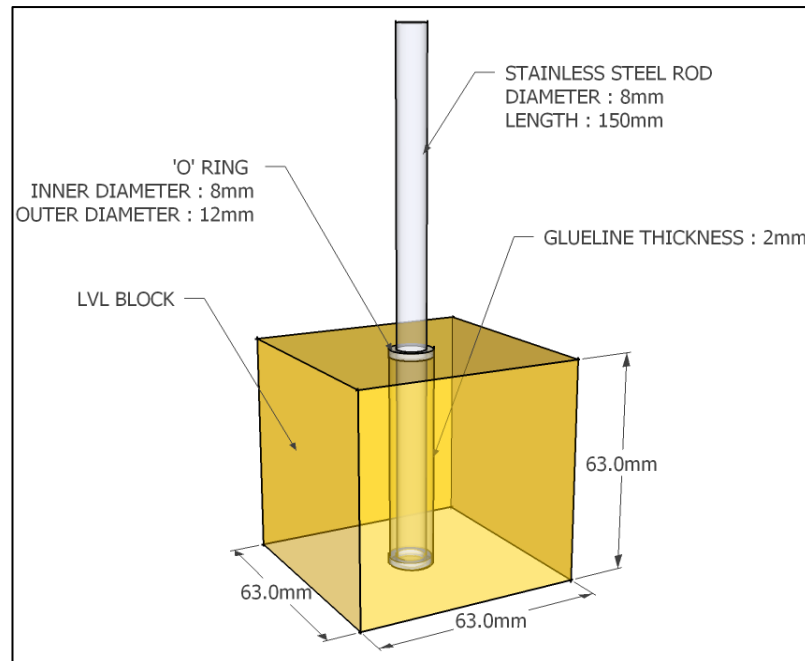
Sample configuration depicting dimension of LVL/wood block, rod and 'o' ring.
